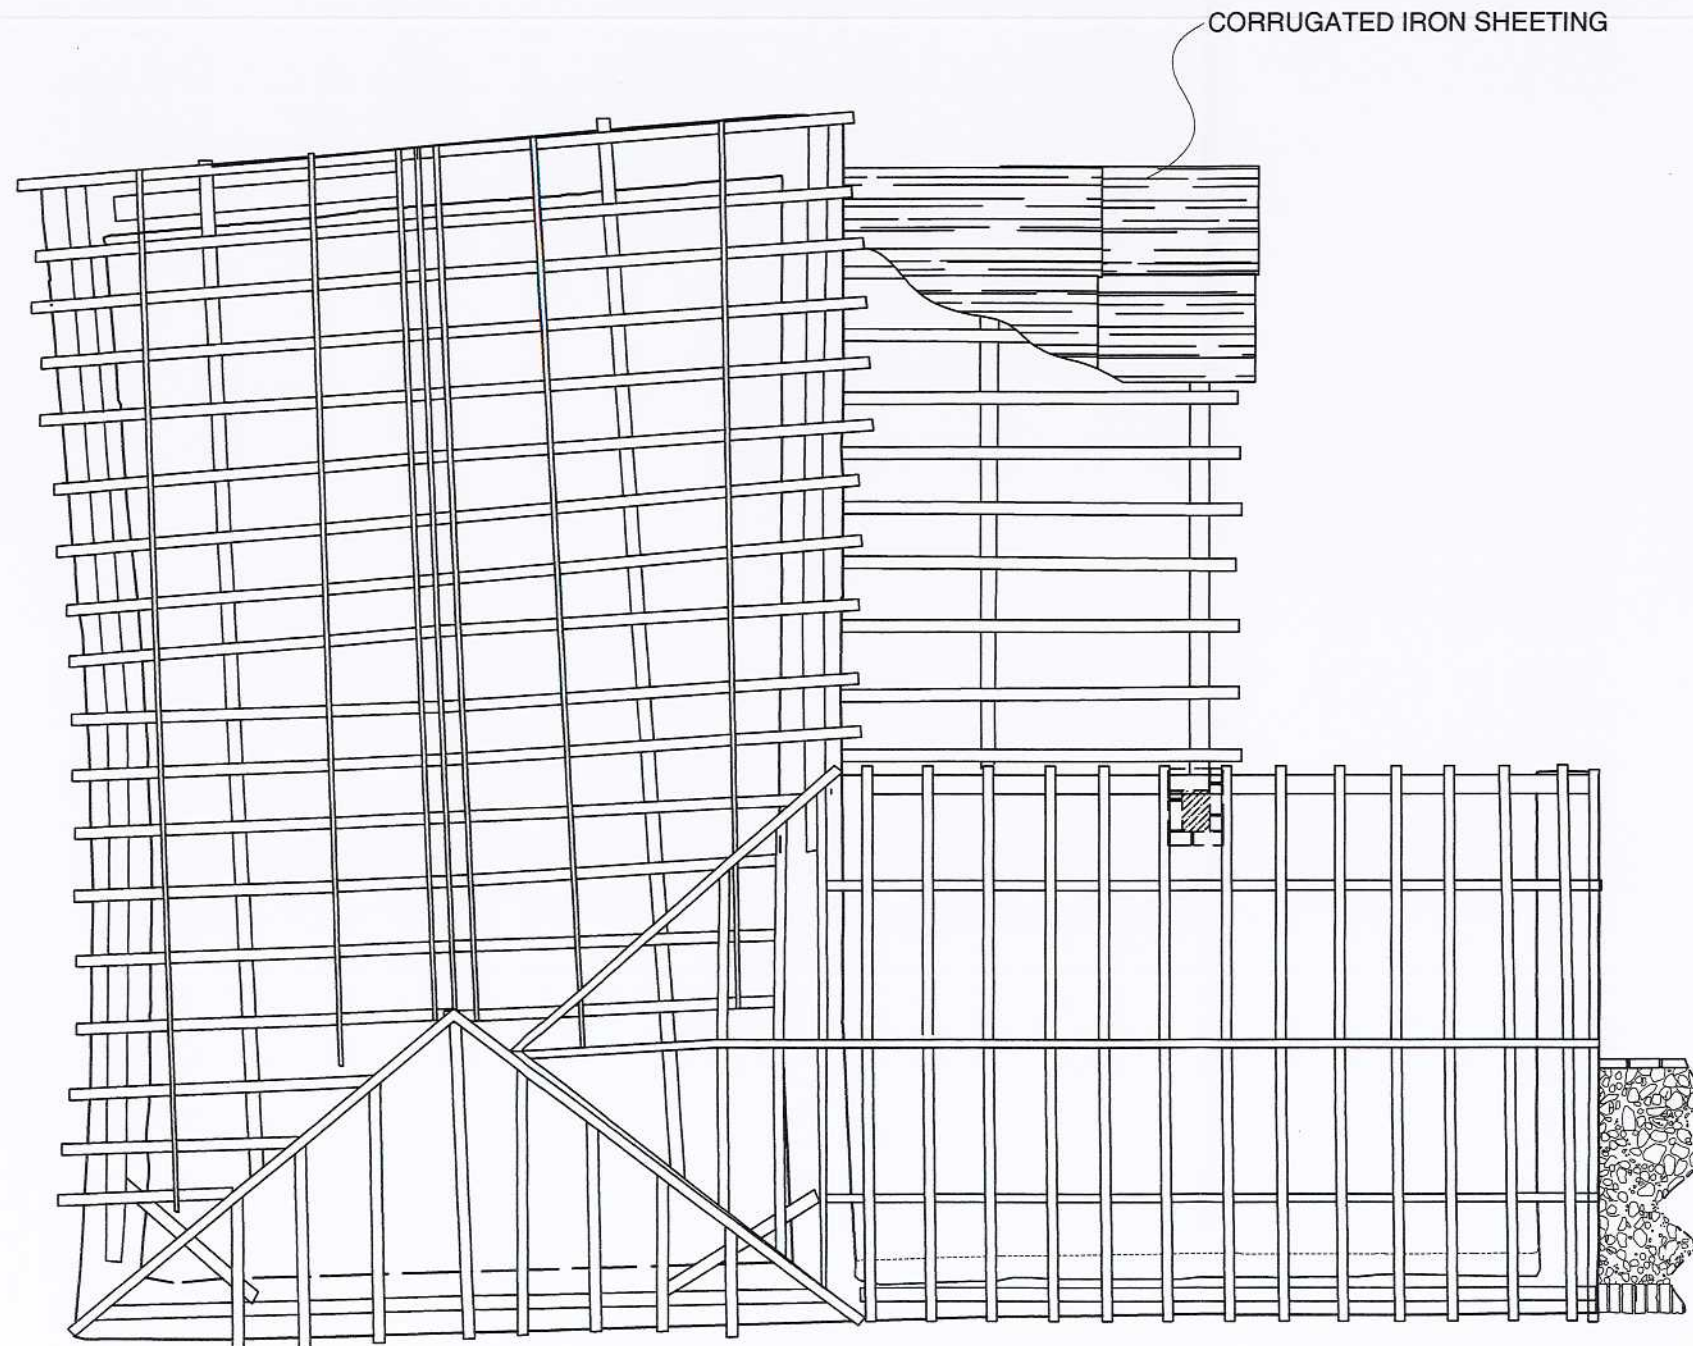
STRUCTURE 3, FIRST FLOOR (FLOOR JOISTPLAN)
